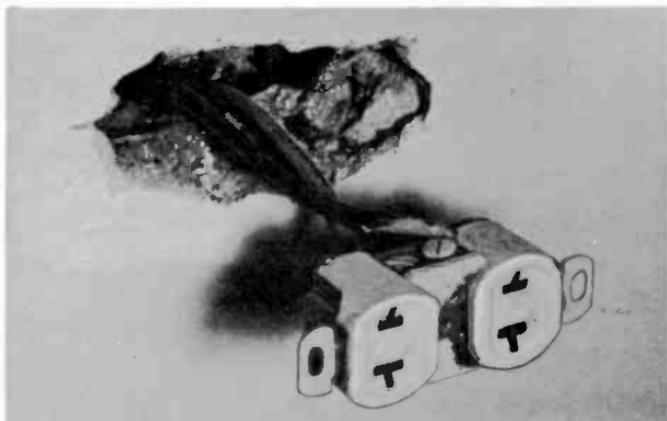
Unscrew duplex outlet and pull towards you to bring out the wires.
